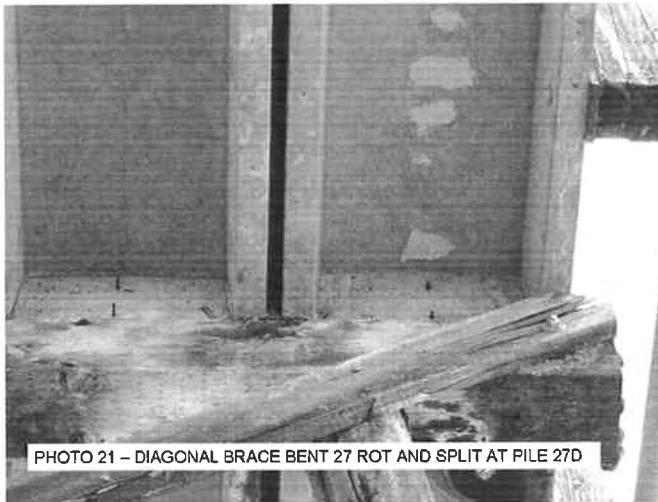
DIAGONAL BRACE BENT 27 ROT AND SPLIT AT PILE 27D
